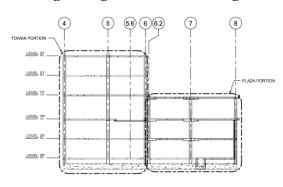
Elevation showing location of expansion joint and relationship between the Plaza portion and Tower Portion
